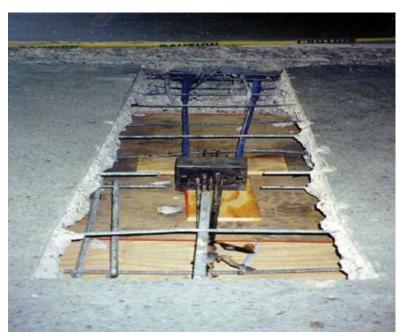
Typical splice arrangement between single button-headed tendon and two monostrand tendons. Photo depicts arrangement at non-stressing end
